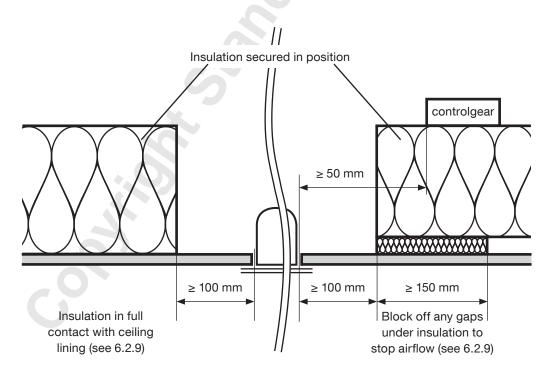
Installing ceiling insulation around recessed luminaires that are NOT of the type CA 80, CA 90, CA 135, IC, IC-F, or IC-4 where insulation is secured in position and where the luminaire manufacturer's instructions are not known
